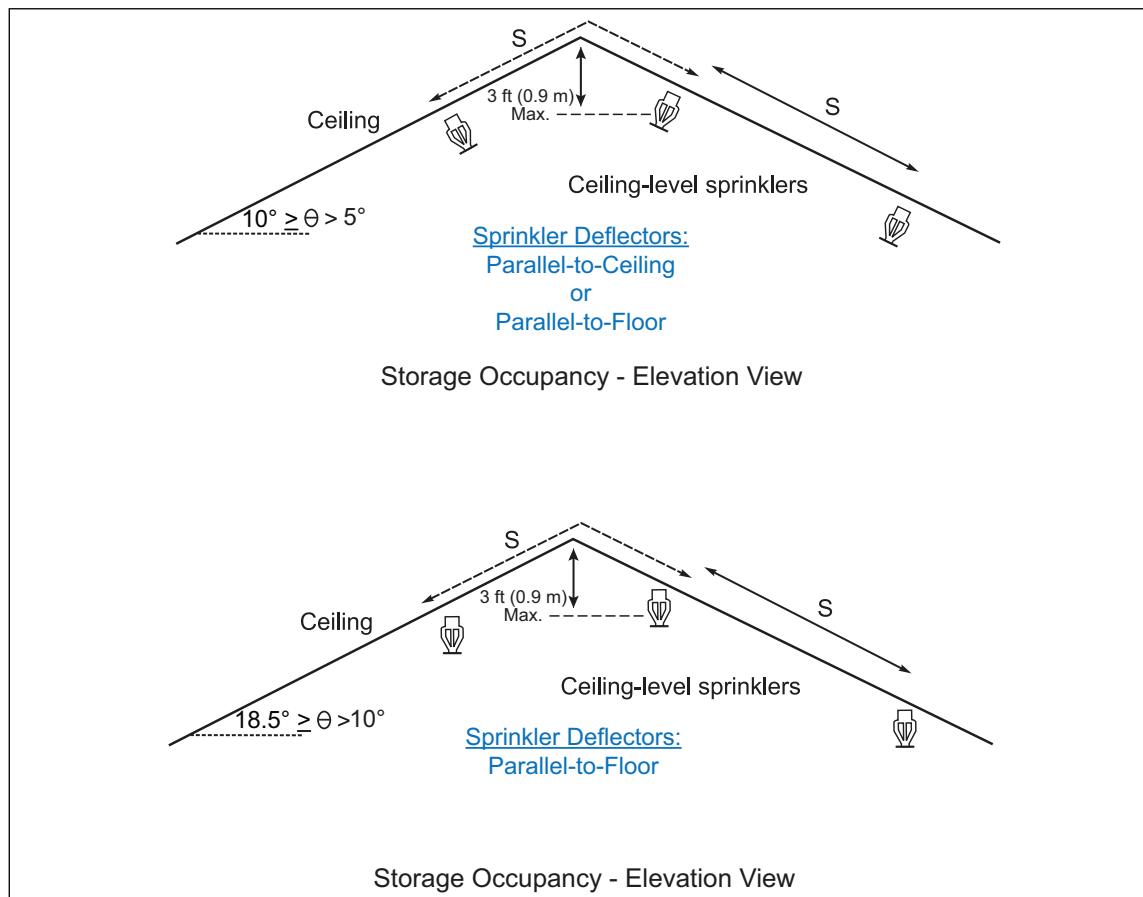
(b). Location and arrangement of Storage sprinklers near ceiling peak when slope exceeds (a) 1 in 12 (5°), and (b) 2 in 12 (10°)
